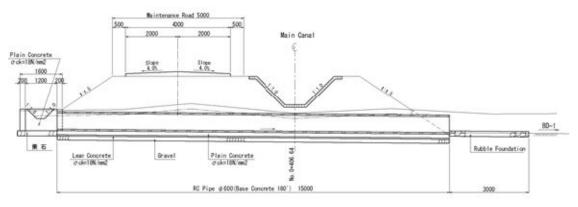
Drainage Pipe Culvert
